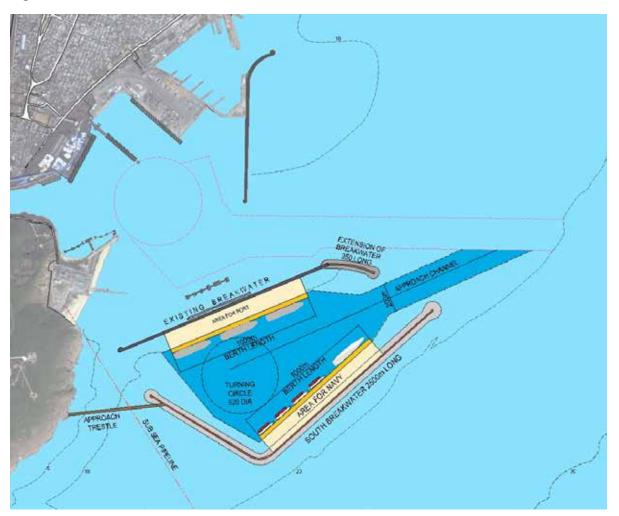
Proposed Outer Harbour - Layout Plan Alternative 2
